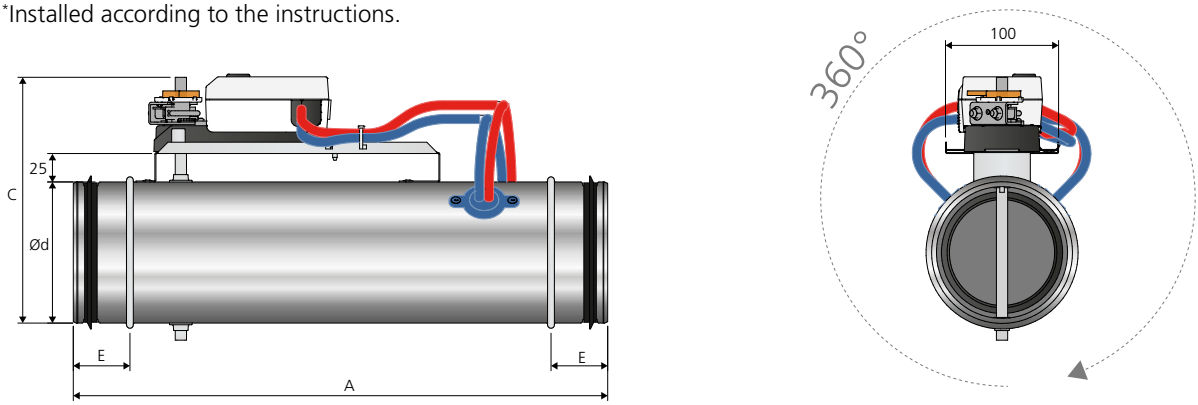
Dimensions (mm), REACT V GMB circular. The damper can be installed at an optional angle.
